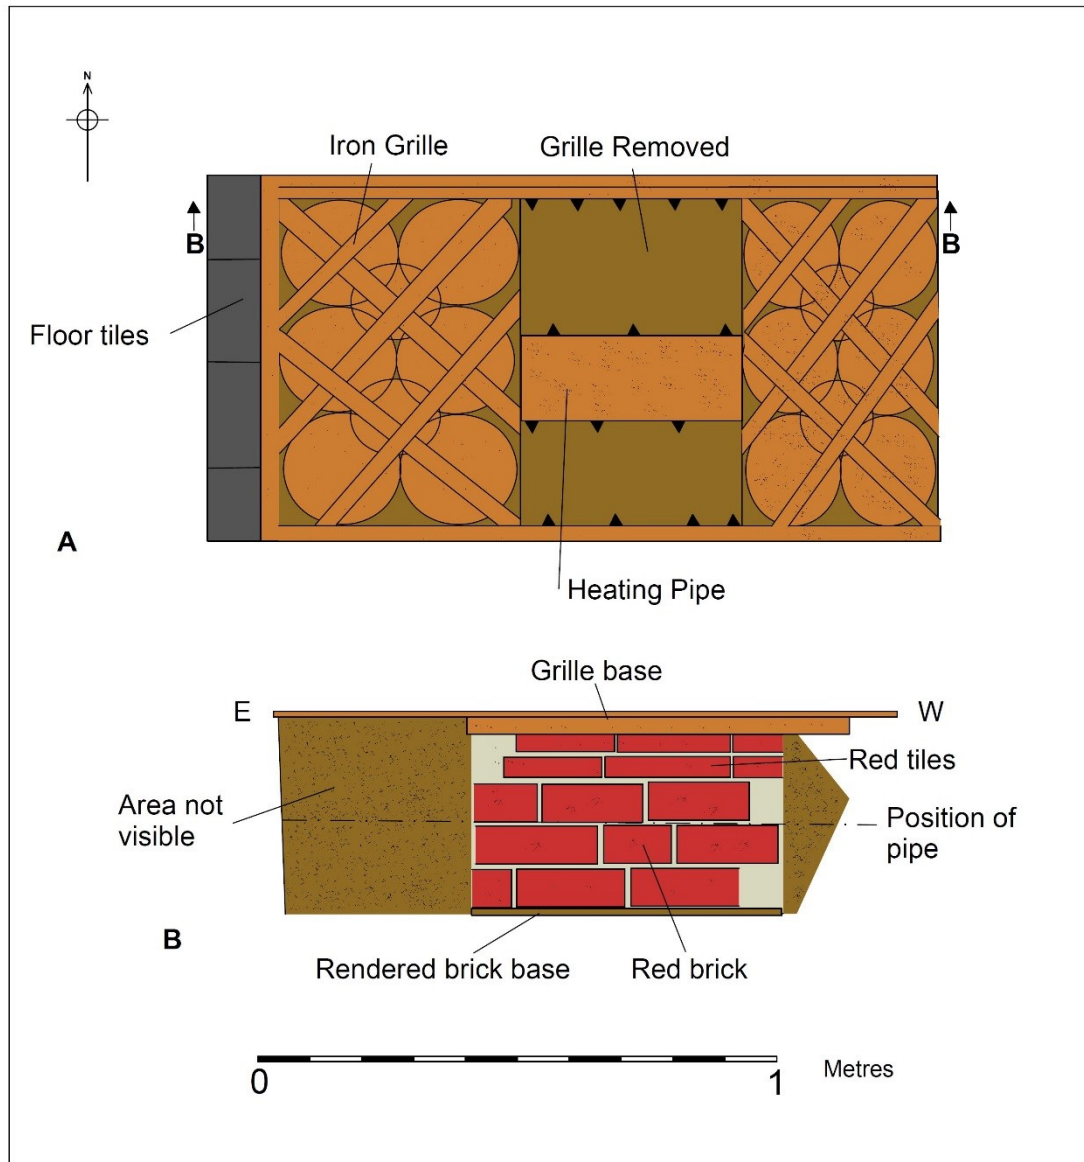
A. Plan of Test Pit 02, with grille part removed. B. North facing section
